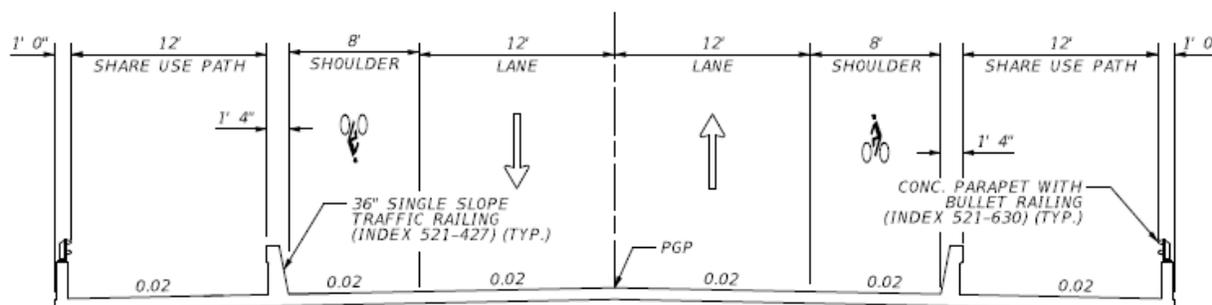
PREFERRED ALTERNATIVE BRIDGE TYPICAL SECTION
